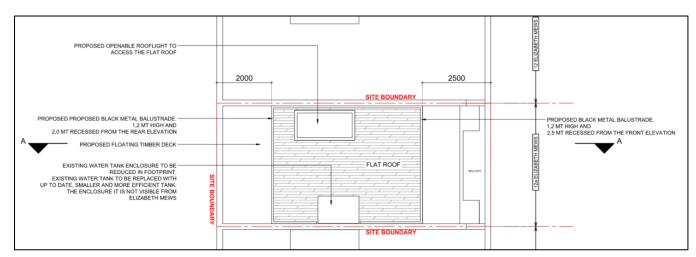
Proposed roof plan, indicating setbacks from the front and rear elevations.
